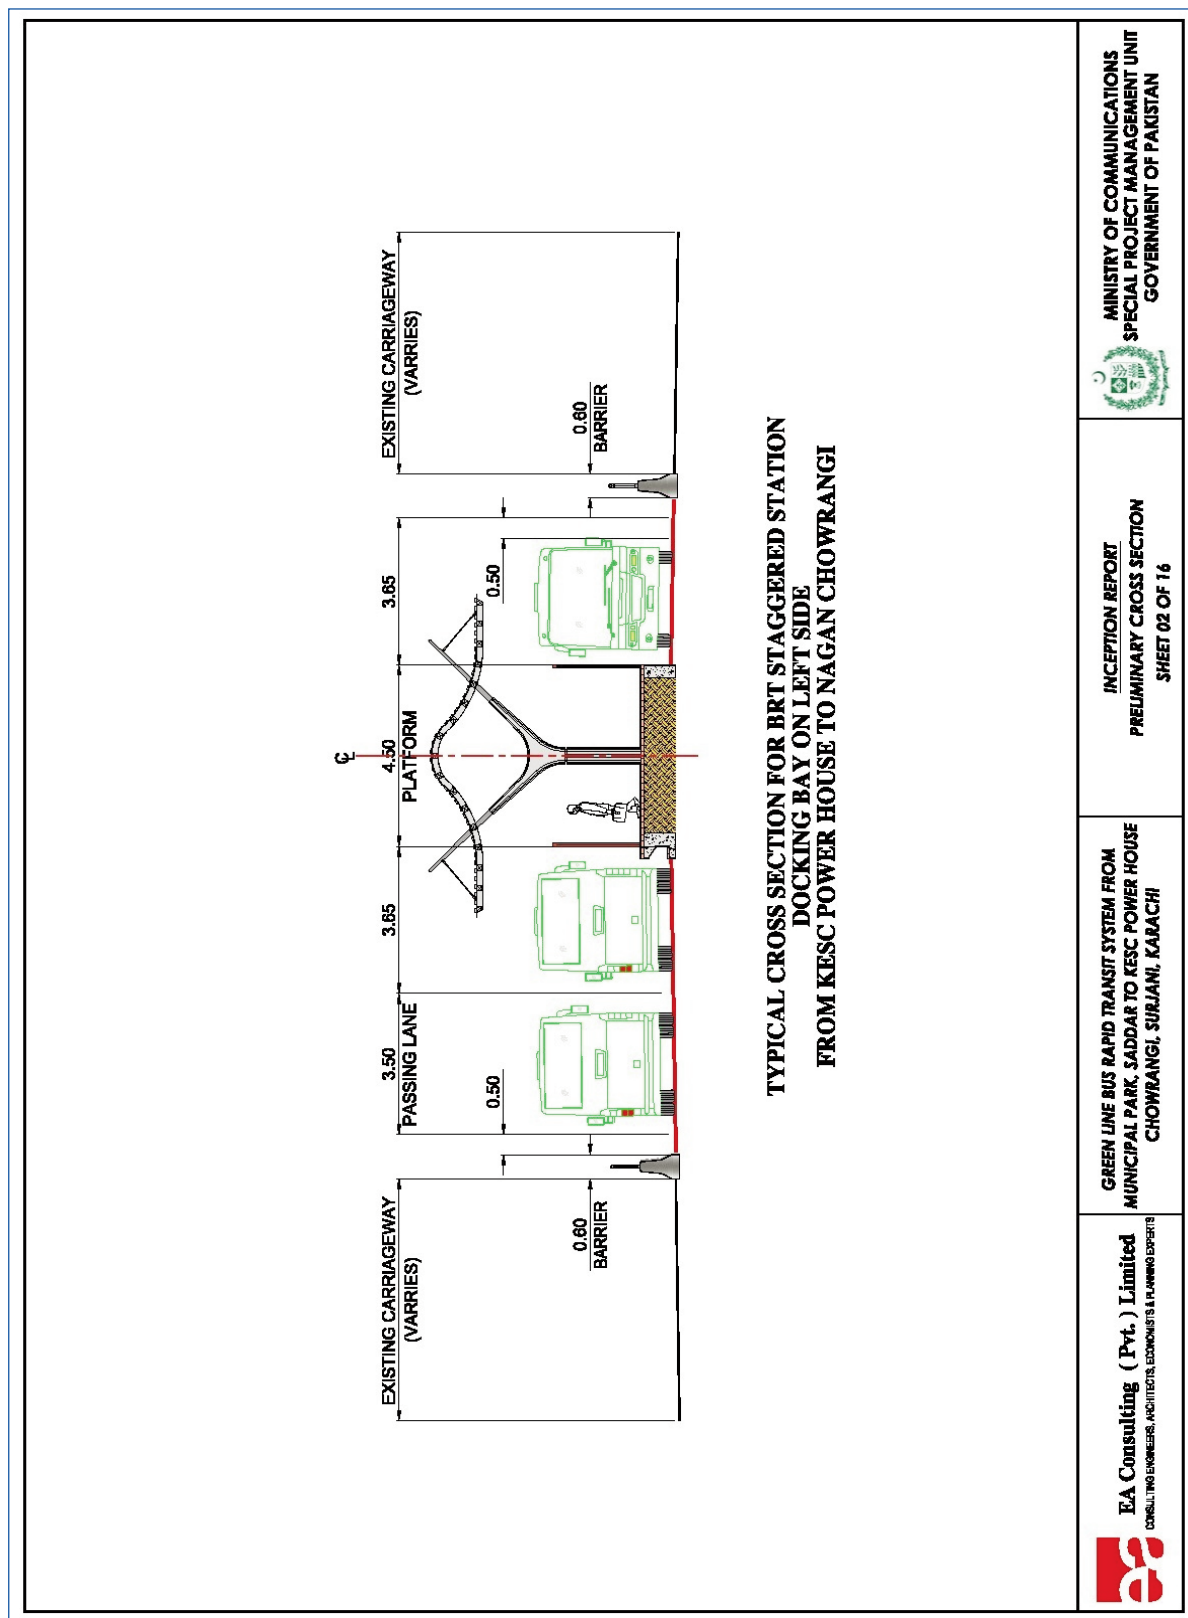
Segment 2: X-section of BRT Staggered Station
